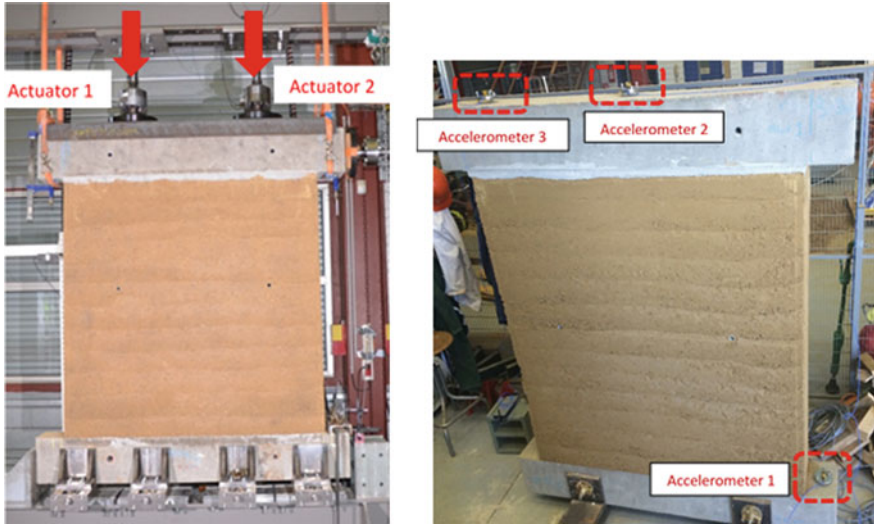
Left: compression test setup on a RE wall. Right: dynamic test setup with accelerometers
